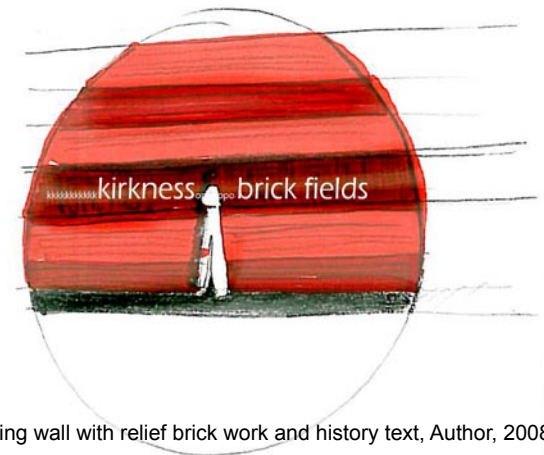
Retaining wall with relief brick work and history text, Author, 2008
